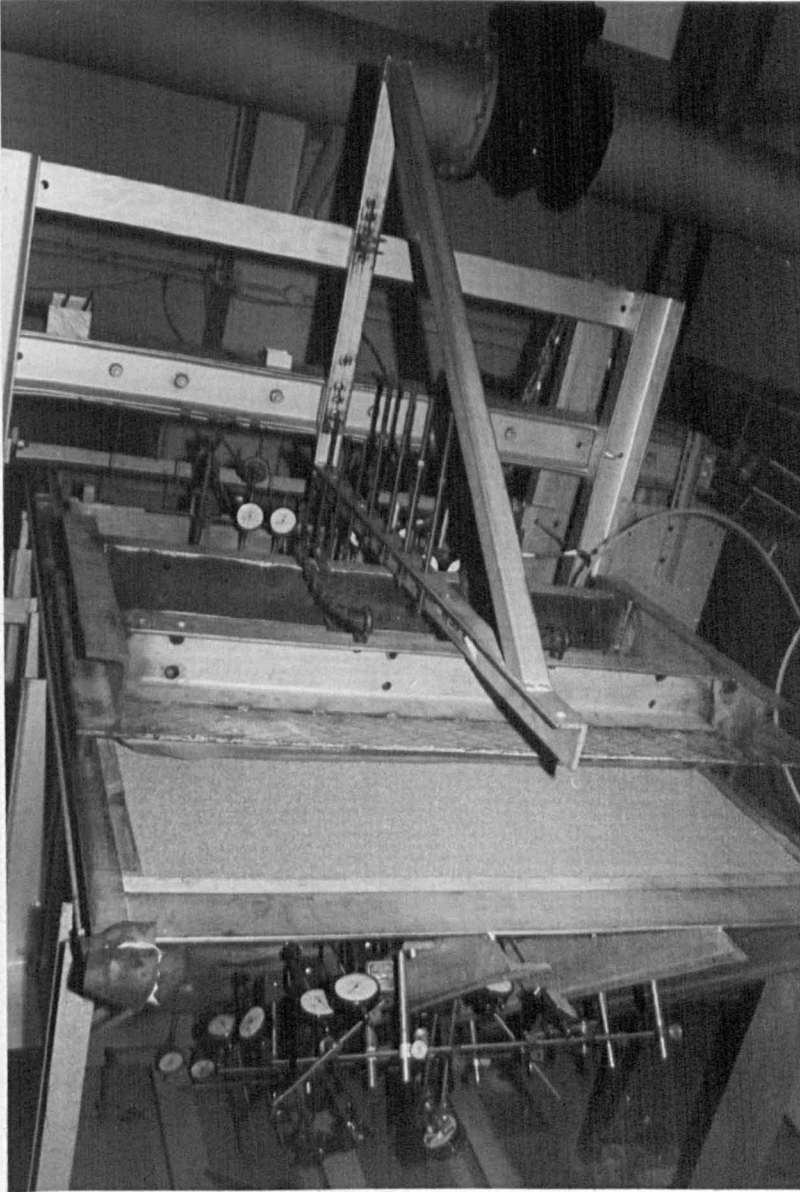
LOADING FRAME AND PRESSURE BAG
